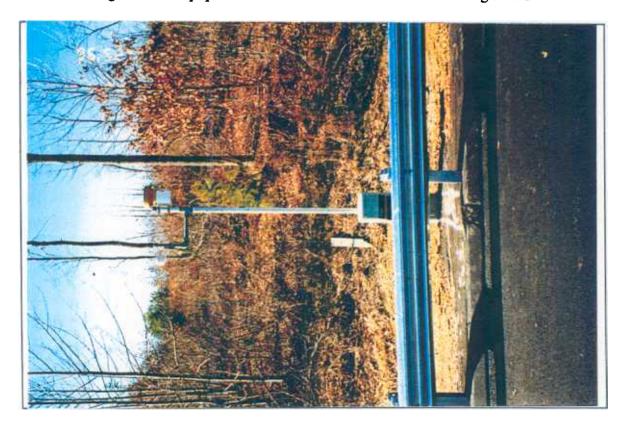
Equipment Cabinet and Weather Station - Facing West
